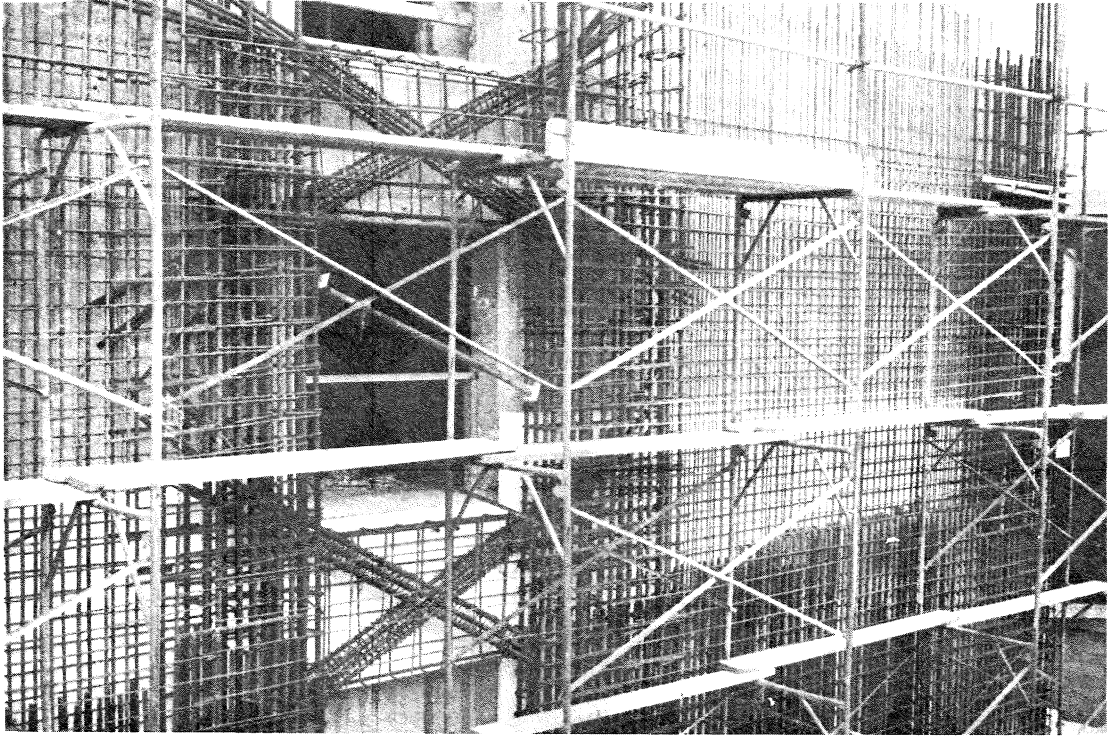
Diagonal Reinforcement for Coupling Beams of Shear Walls During Construction
